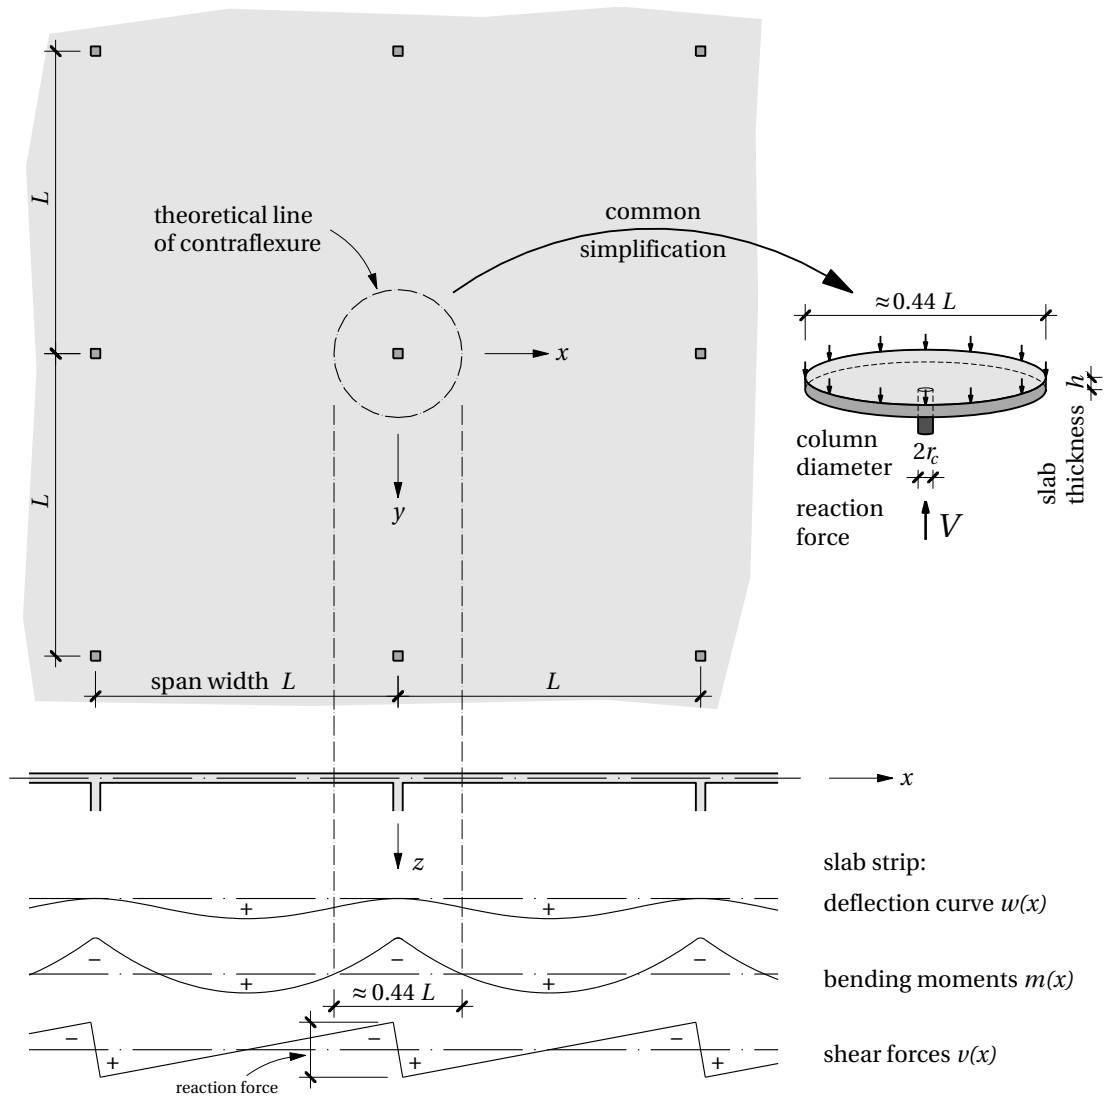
Plan view of typical flat slab, section of slab strip with internal forces, and common simplification by punching models considering a circular slab cutout with diameter $0.44L$ (adapted from Beutel 2003)
